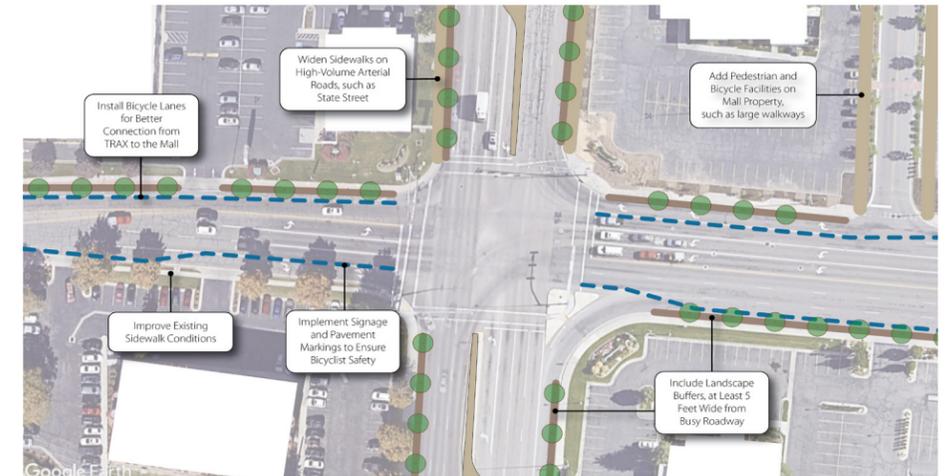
The intersection of State Street and Winchester Street currently lacks a safe bicycle experience. Future improvement recommendations include better bicycle lane signage as well as sidewalk improvements.
